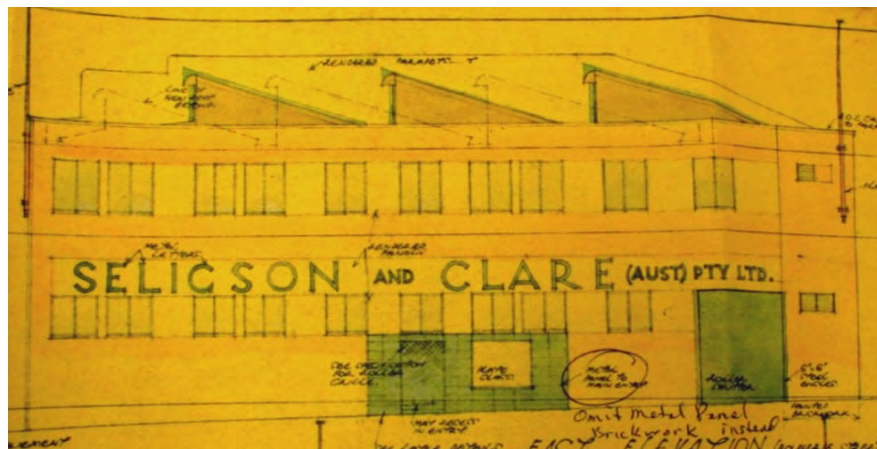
1956 permit drawings showing first floor additions to the Bouverie Street elevation. Source: Public Records Office Victoria.
